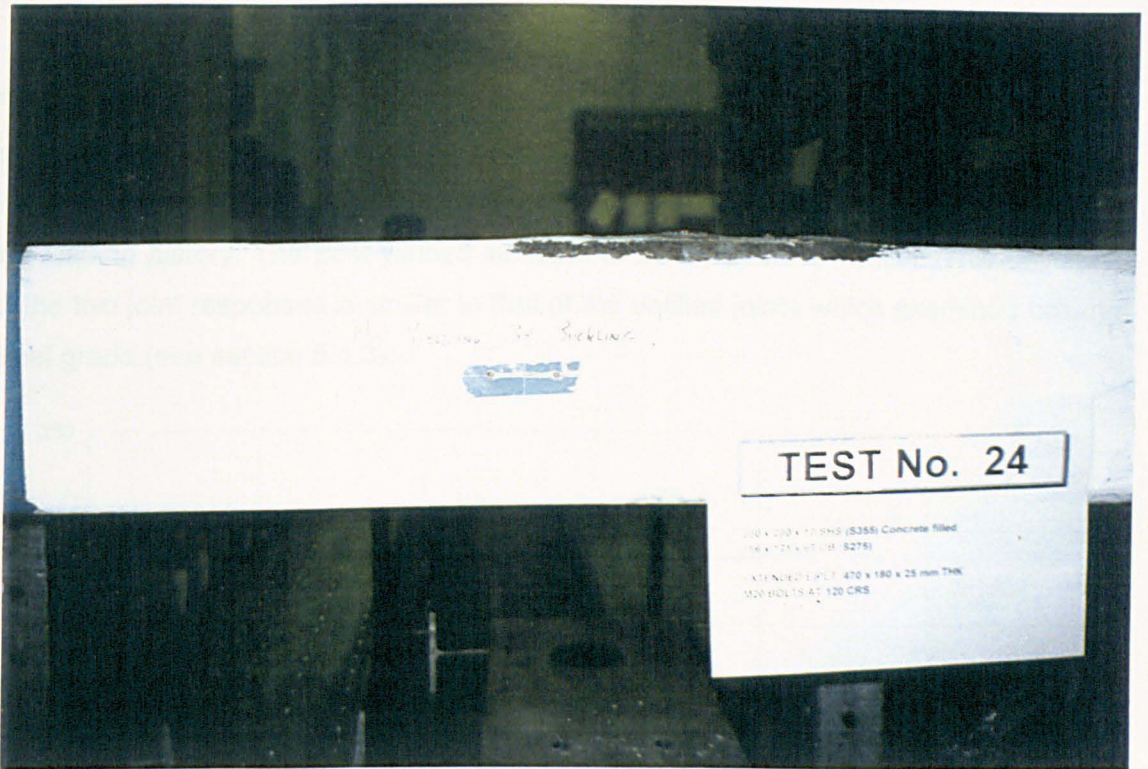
Joint test no. 24 after failure- Concrete filled column
